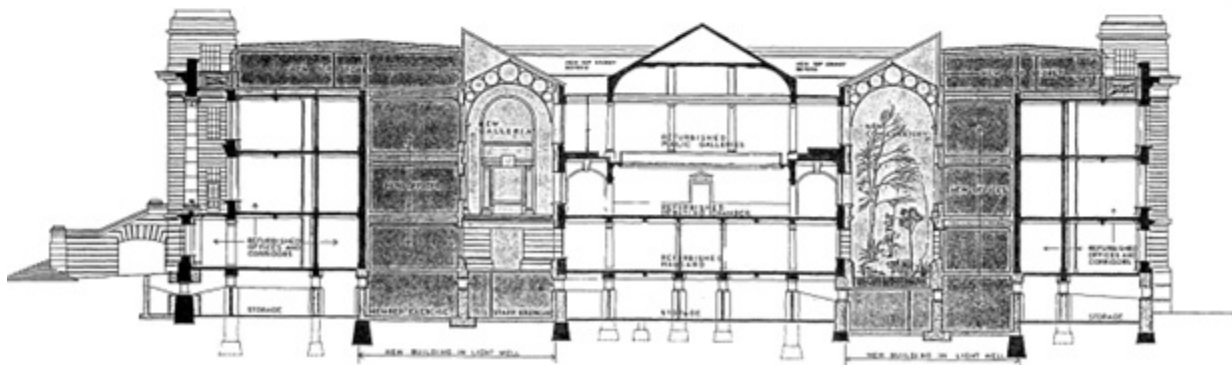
Section through Parliament Building showing proposed strengthening and refurbishment.
